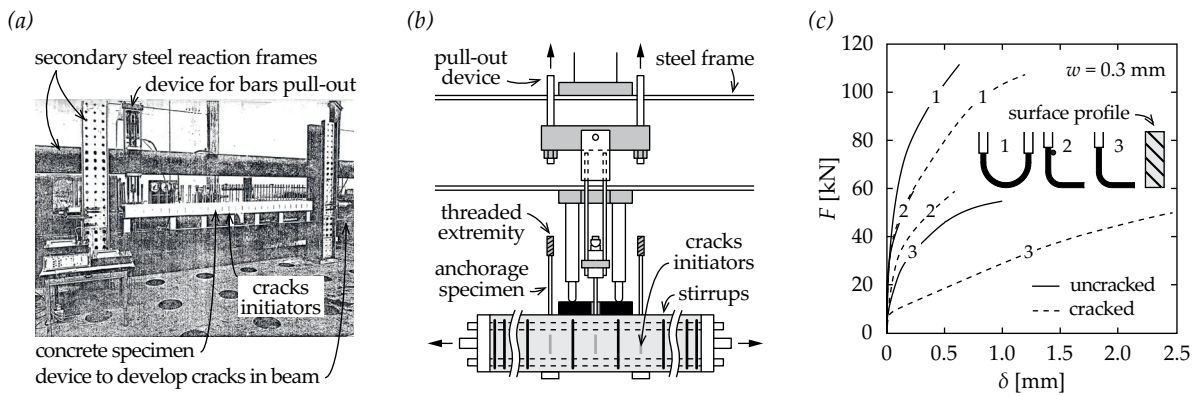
Bend bar details in cracked concrete (adapted from [Reh79]): (a) general view of the test setup; (b) detailed view of the test setup; and (c) force-slip relationships for various details (solid lines: uncracked concrete, dashed lines: cracked concrete)
